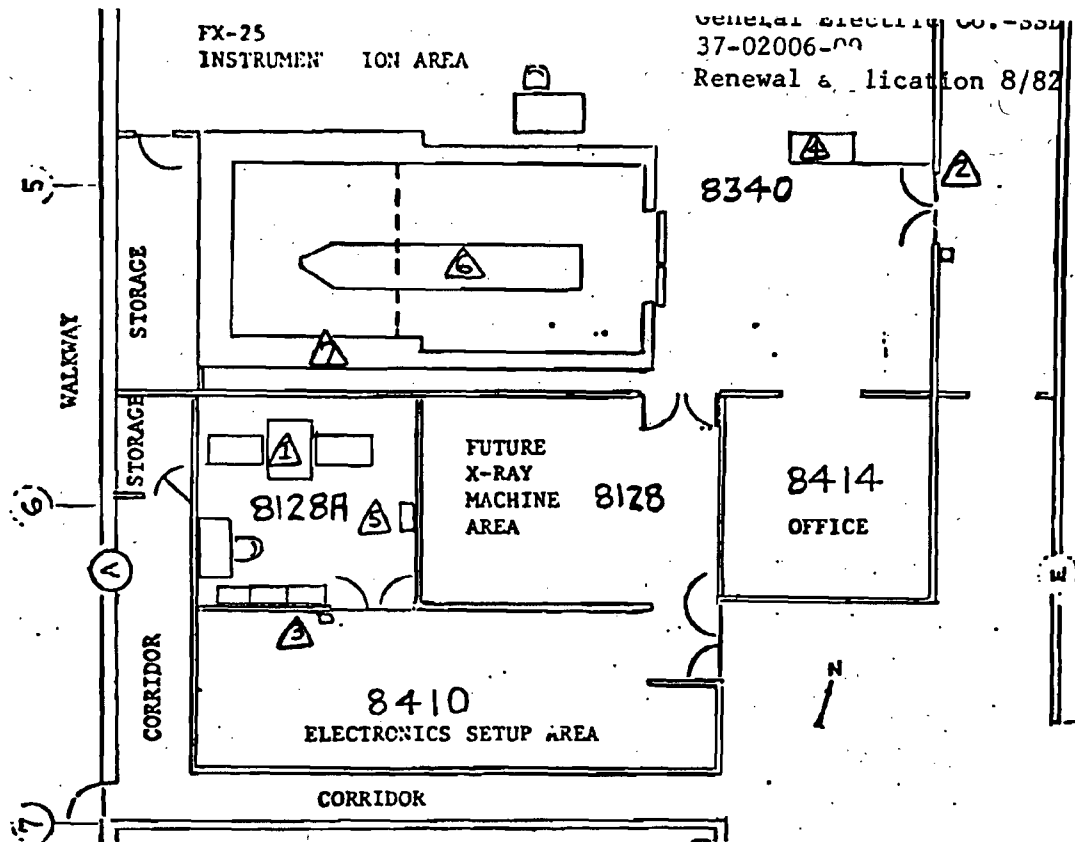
RADIATION LABORATORY FLOORPLAN
